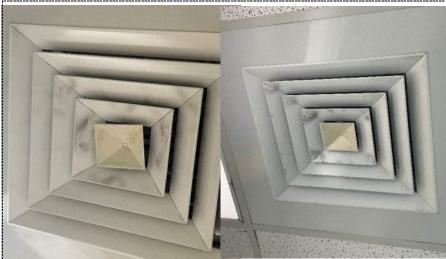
Impacted diffusers throughout North and South classroomsbuilding 2.
